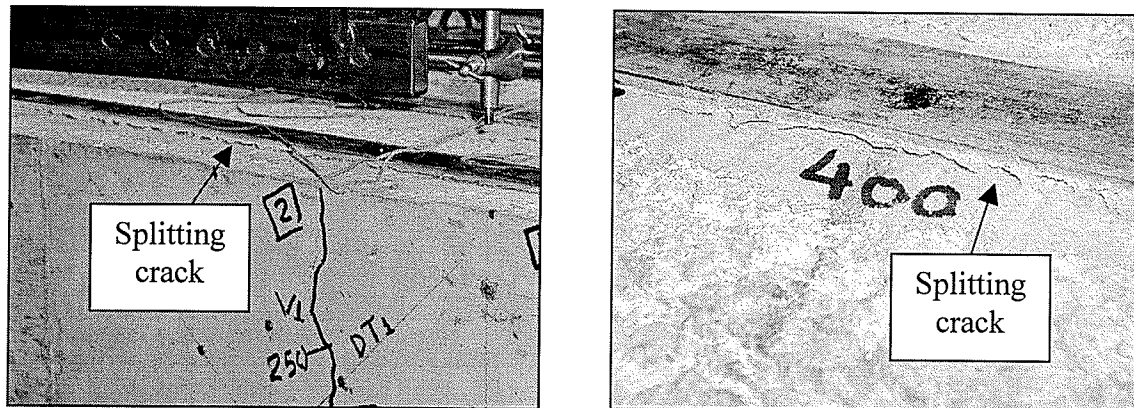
Initial cracking in the concrete substrate of specimen C3 at 400 kN
